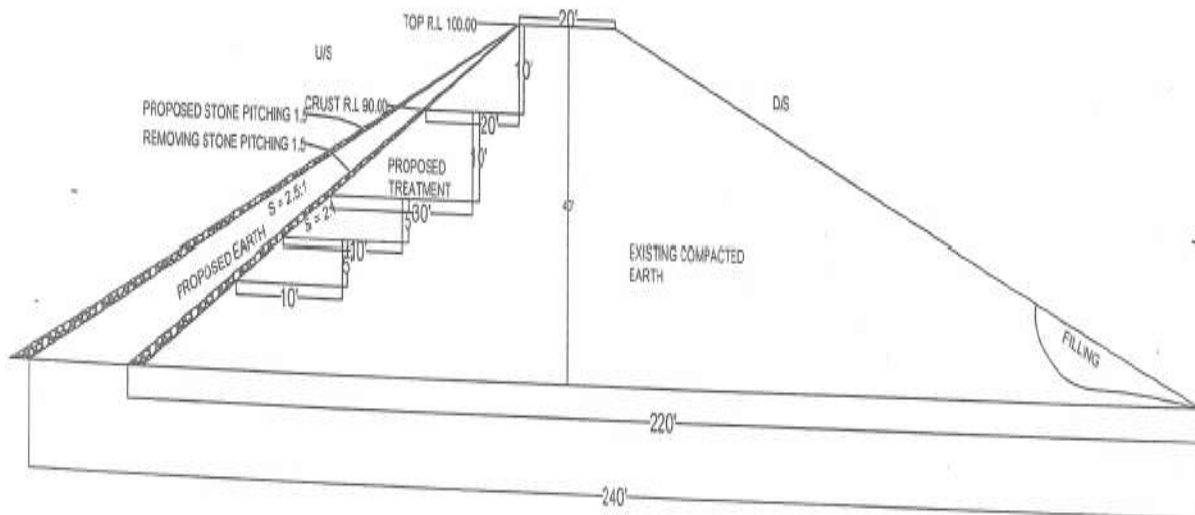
Typical X-Section Shagai-11 Delay Action Dam RD 400
